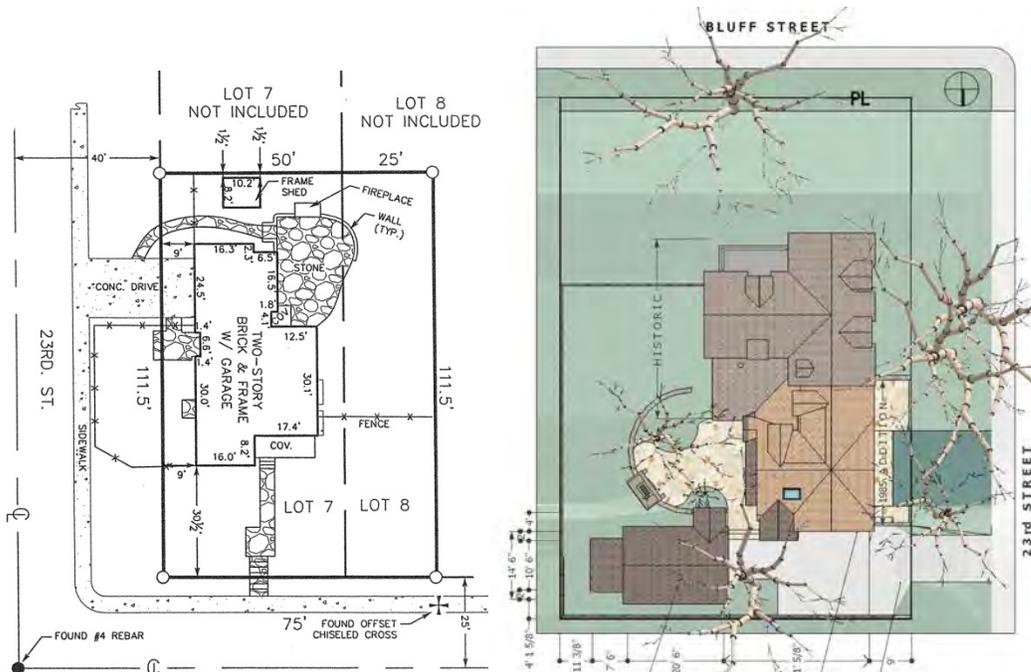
April 4<sup>th</sup>, 2015 (left) and Proposed Site Plans (right). Not to scale
